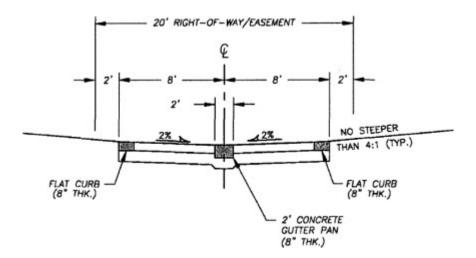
Narrow Lot Alley Cross-Section
